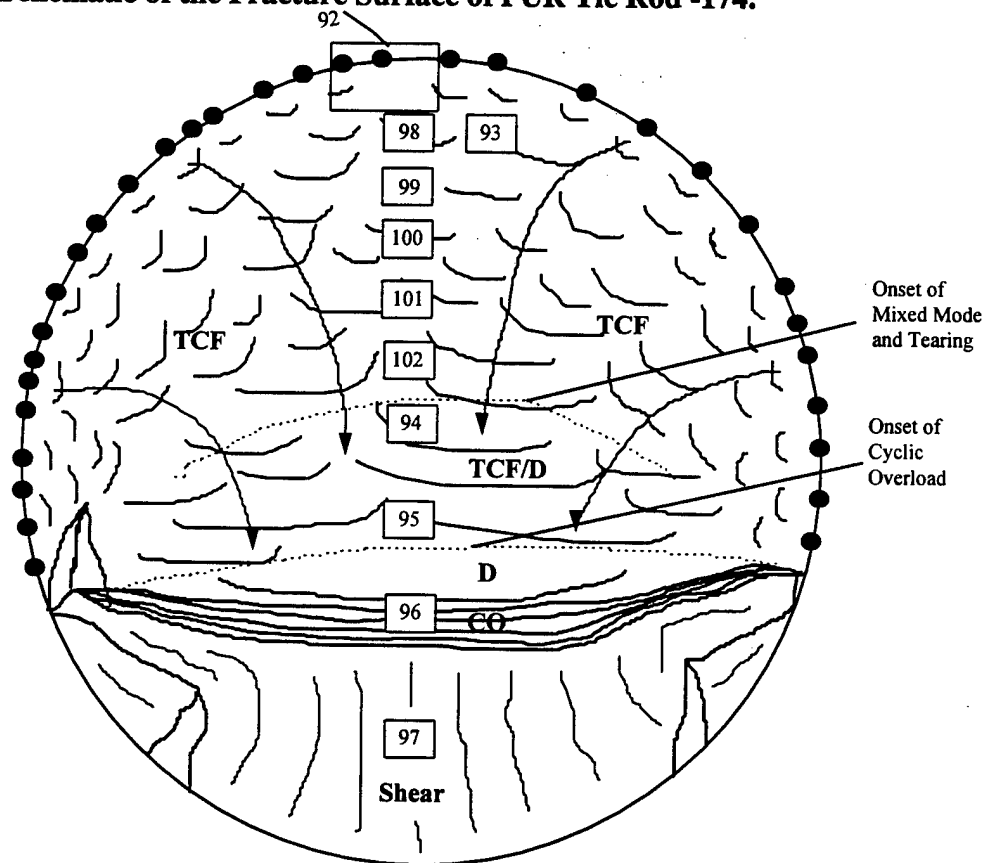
Schematic of the Fracture Surface of PUR Tie Rod -177.
